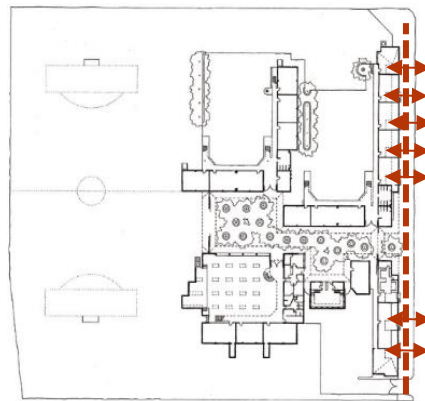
Plan active street edge of Usasazo Secondary (Adapted by author, from Wolff Architects (2024:online).
